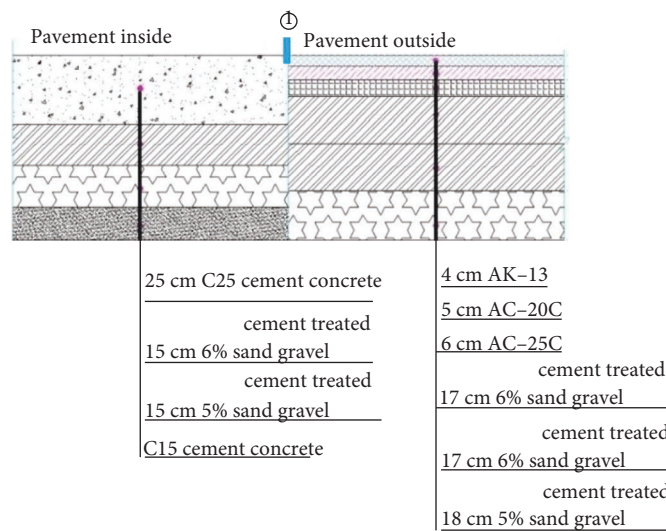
The original pavement structures in the entrance and exit sections of the Yangkou tunnel (Str-2).
